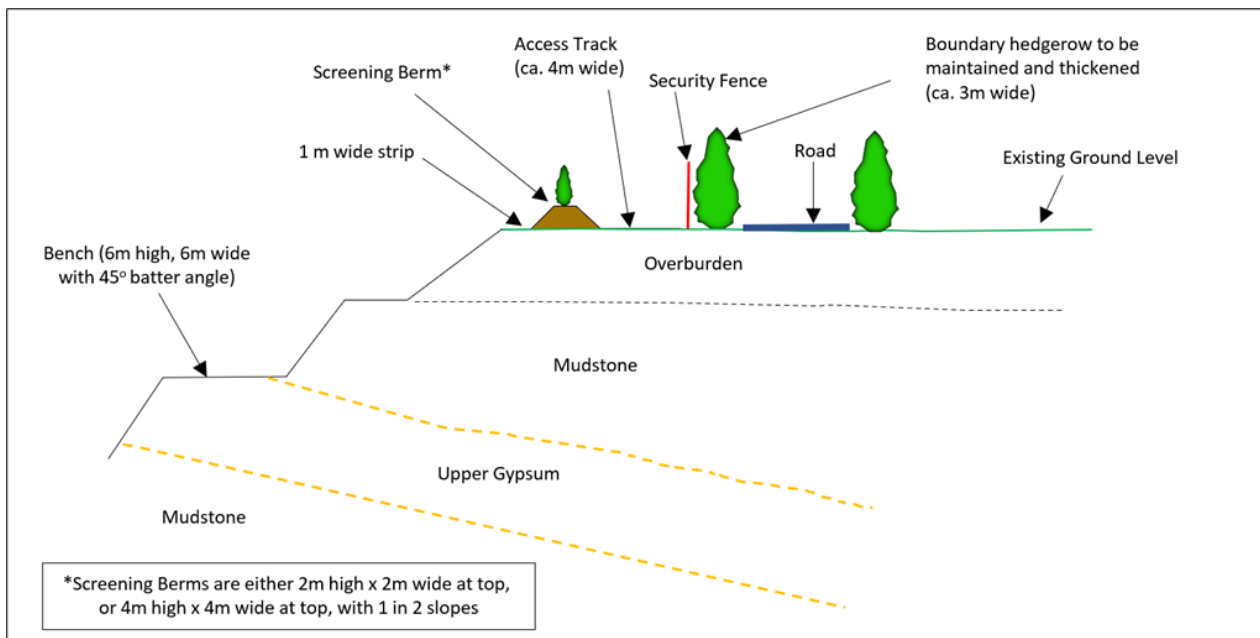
Schematic cross-section of generic boundary treatment for the Knocknacran West Mine site
